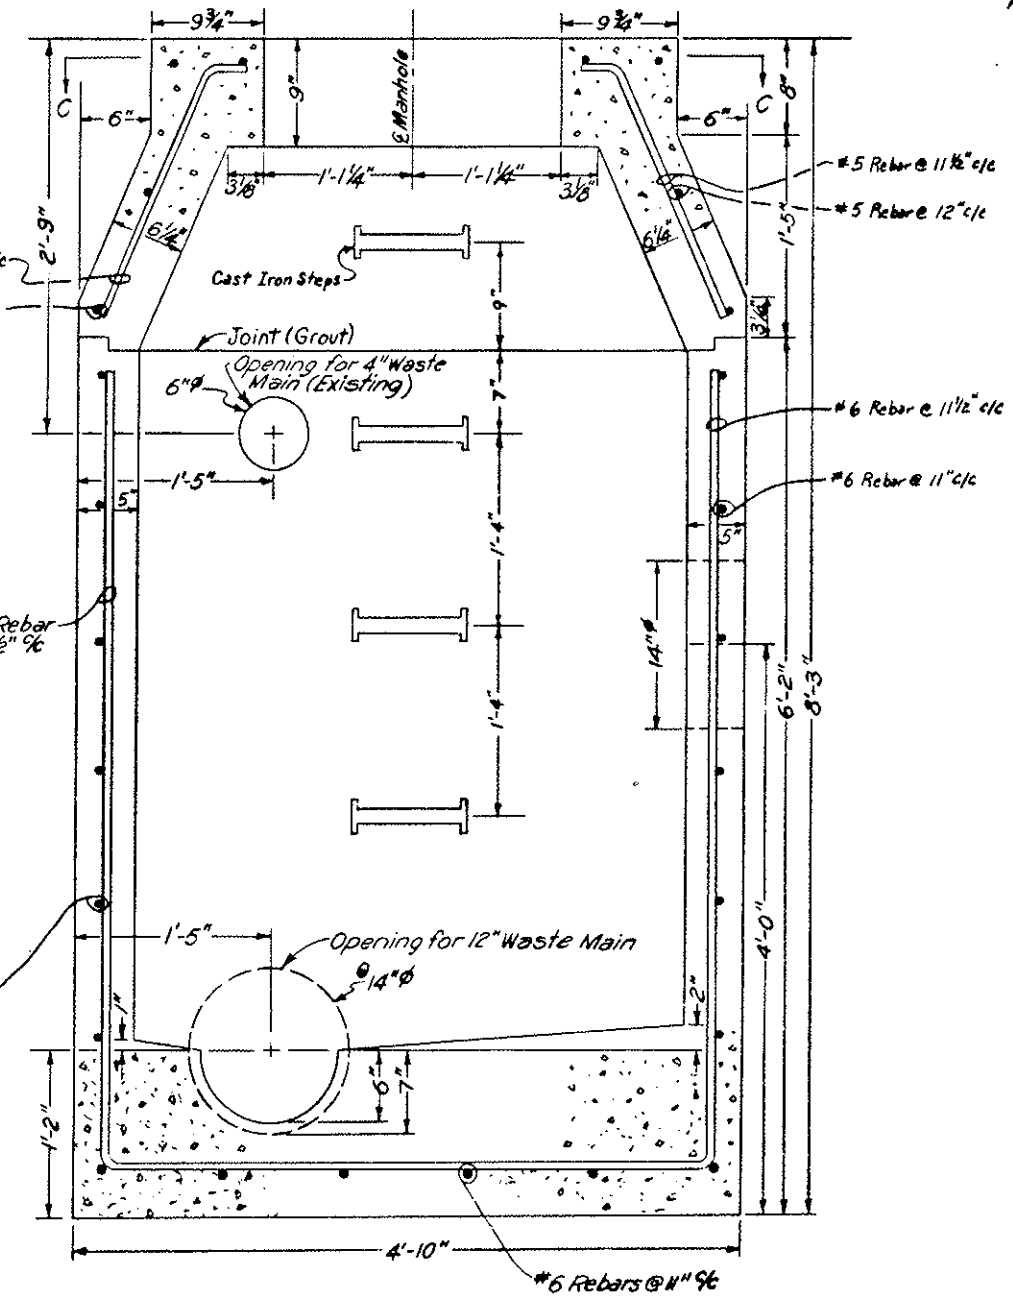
DETAILS OF MANHOLE SPECIAL (TYPE V) (Sta. 125+77.36 South Side)
